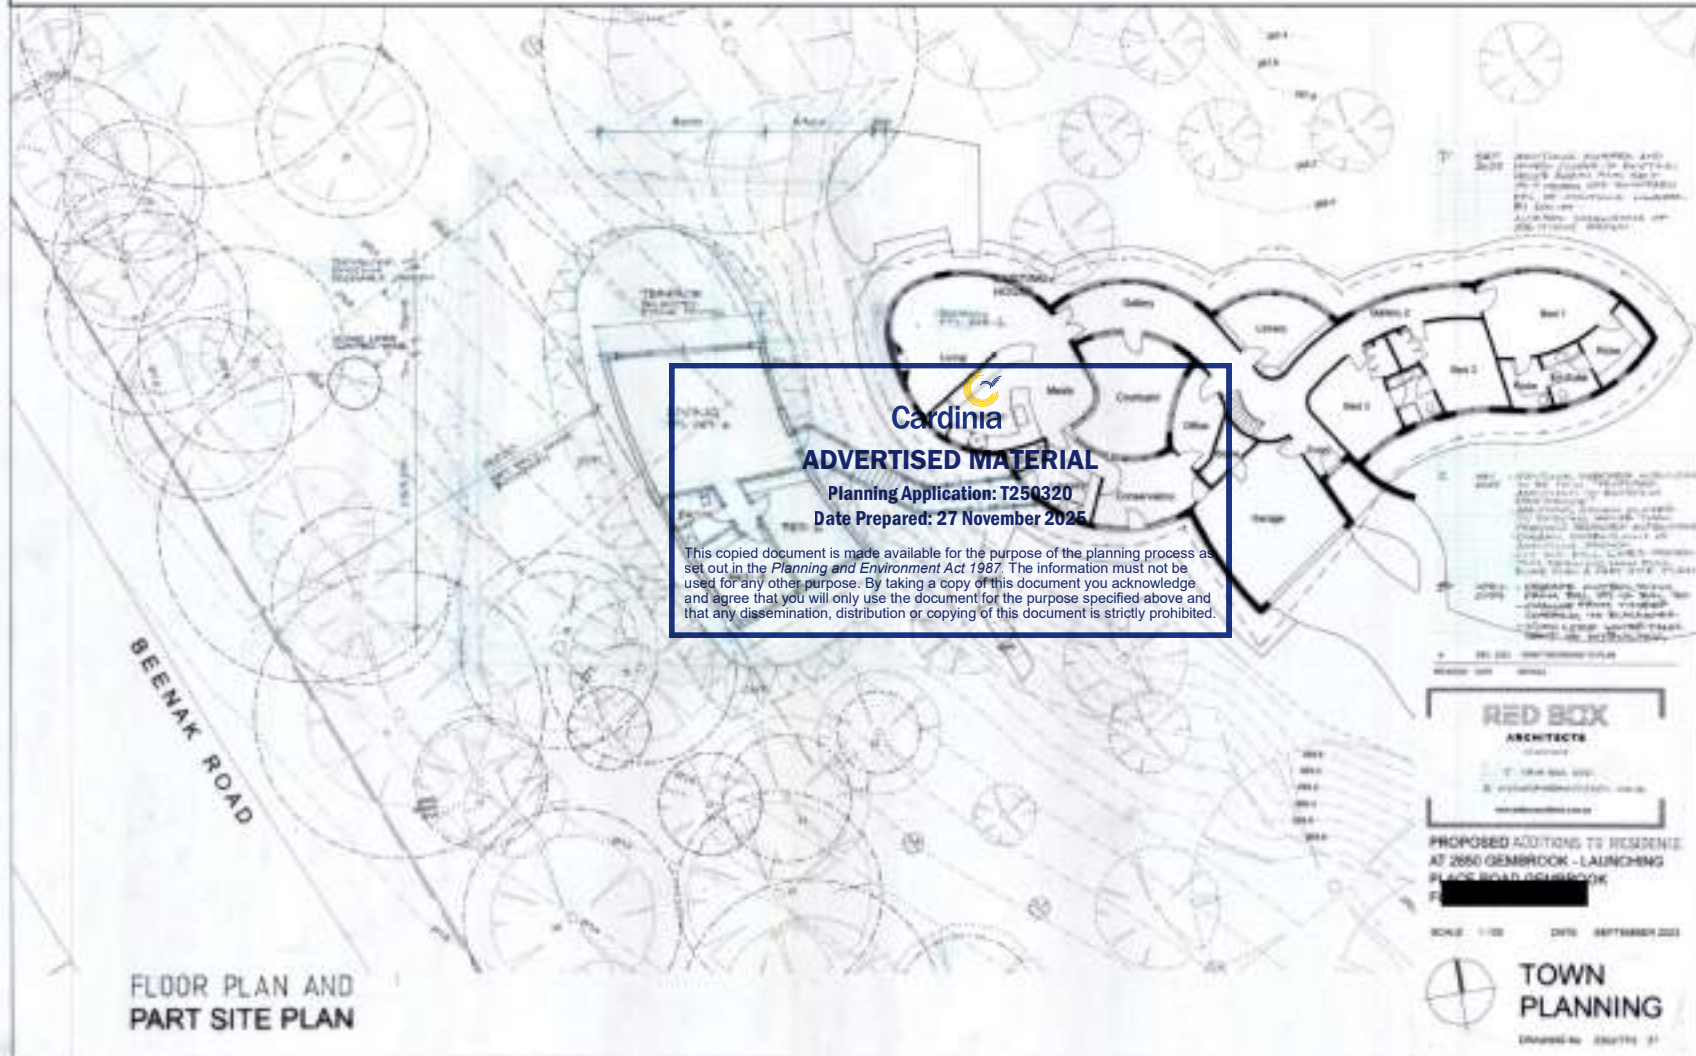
Proposed location of the extension in relation to current dwelling and driveway at 2850 Gembrook - Launching Place Road, Gembrook.
